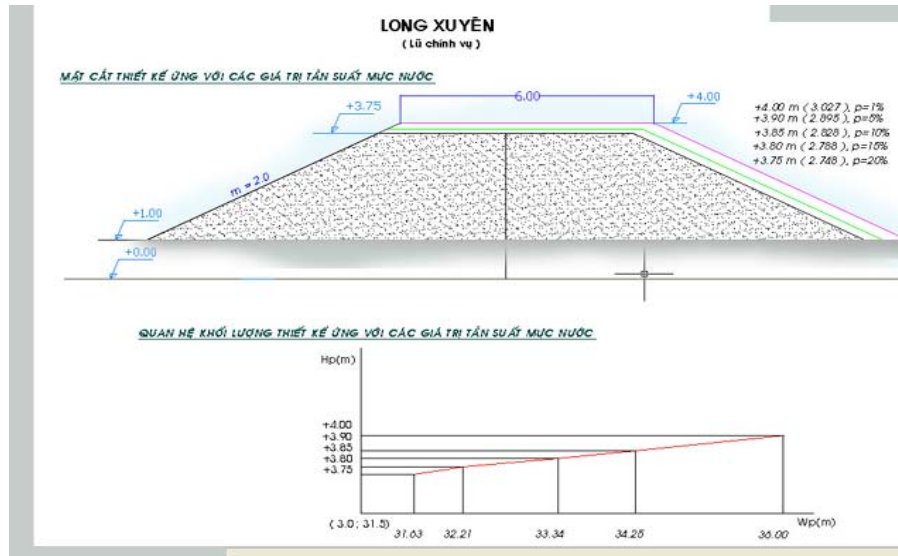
Typical cross-section of embankment for Long Xuyen City
